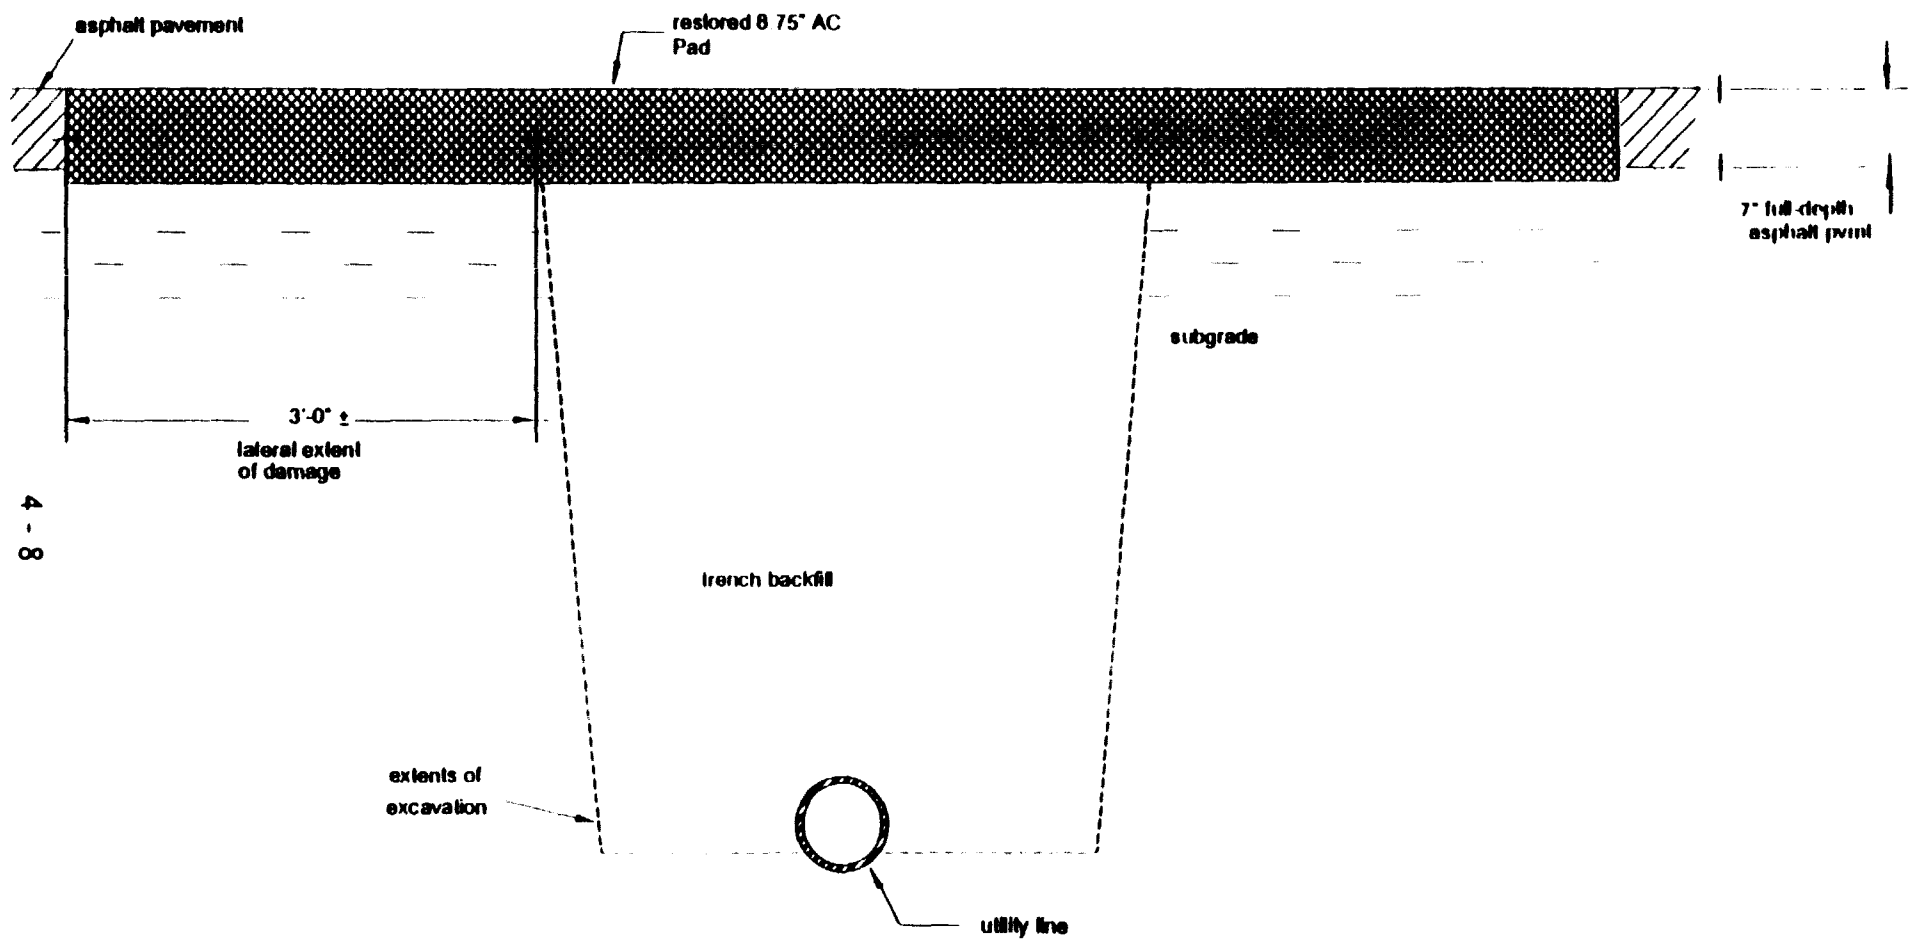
Pavement Strengthening by Replacing the 7 in. Thick AC Pavement with an 8.75 in. AC Pad - Scheme 3
